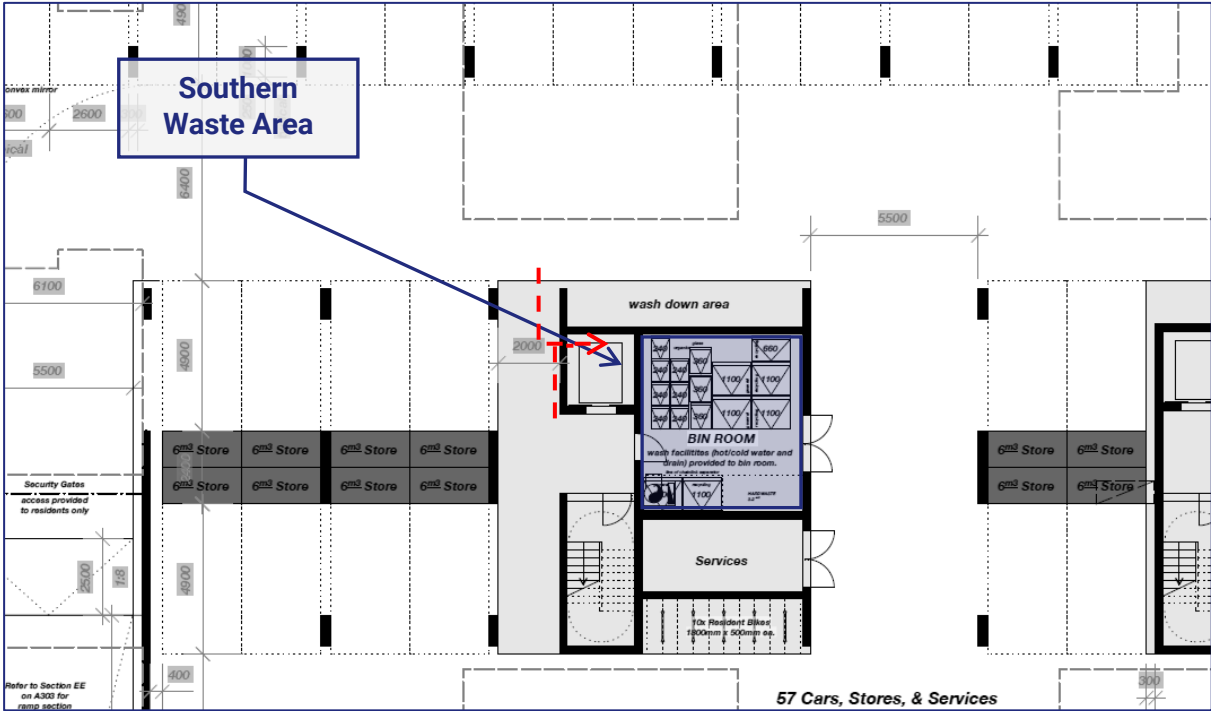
Proposed Waste Area & Pedestrian Access Route – Southern Dwellings
